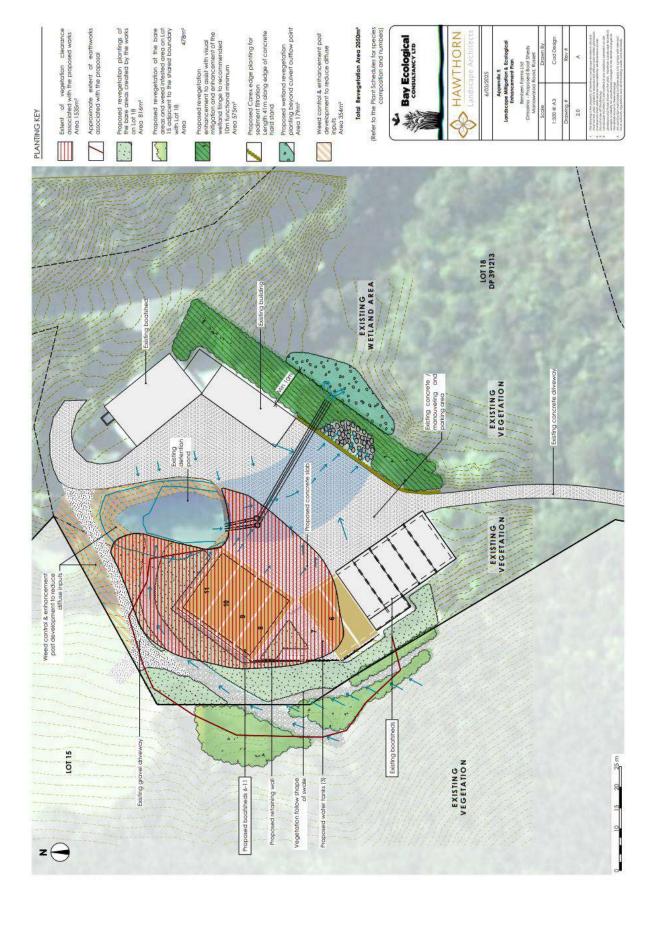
LANDSCAPE MITIGATION AND ECOLOGICAL ENHANCEMENT (OFFSET) PLAN
